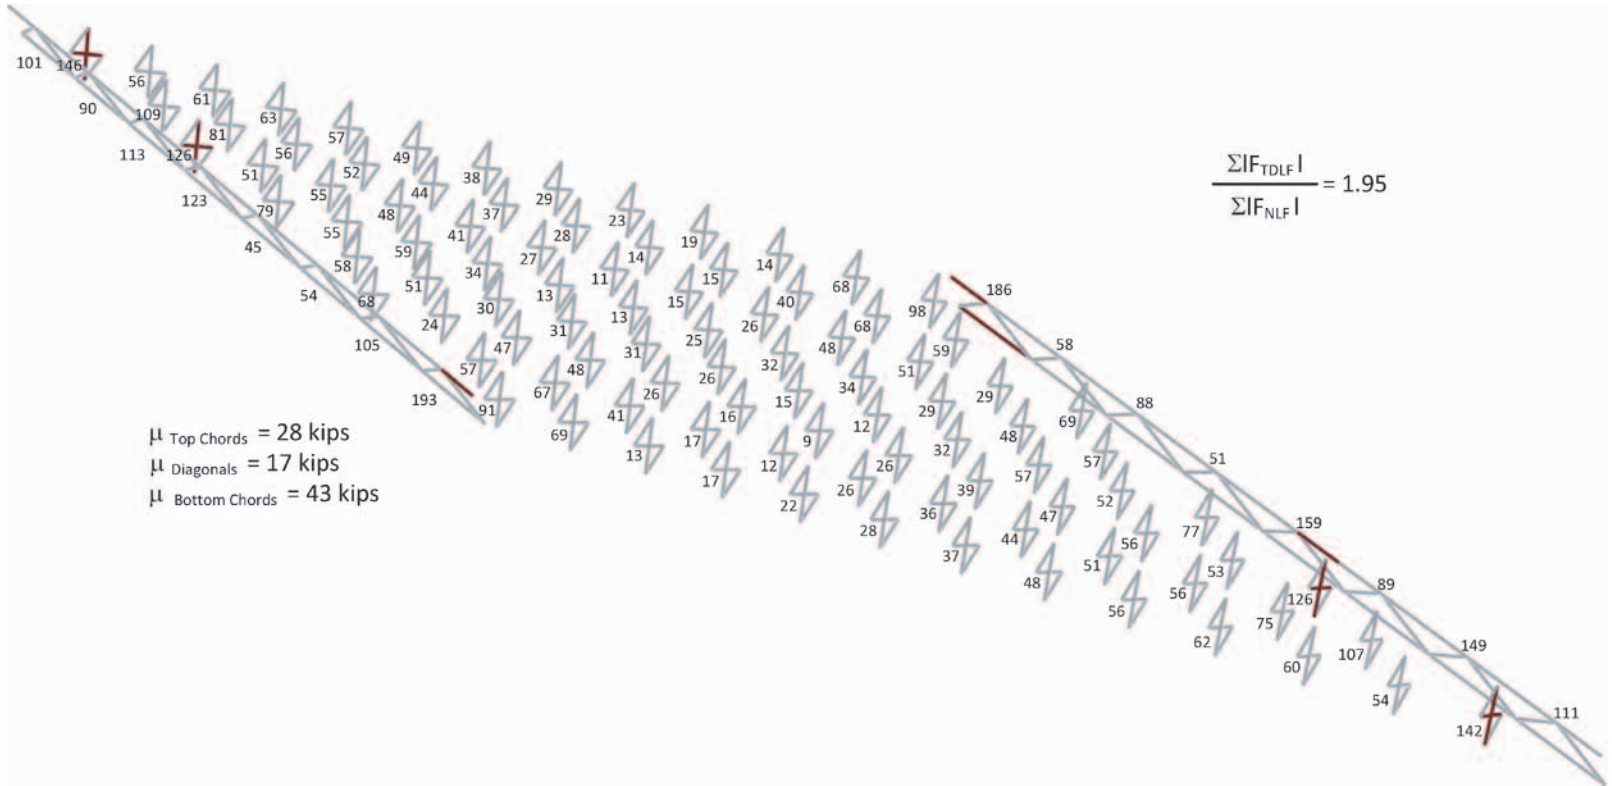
Bridge NISS54 maximum amplitude of the component axial forces in each of the cross-frames under steel dead load, TDLF detailing of the cross-frames.
